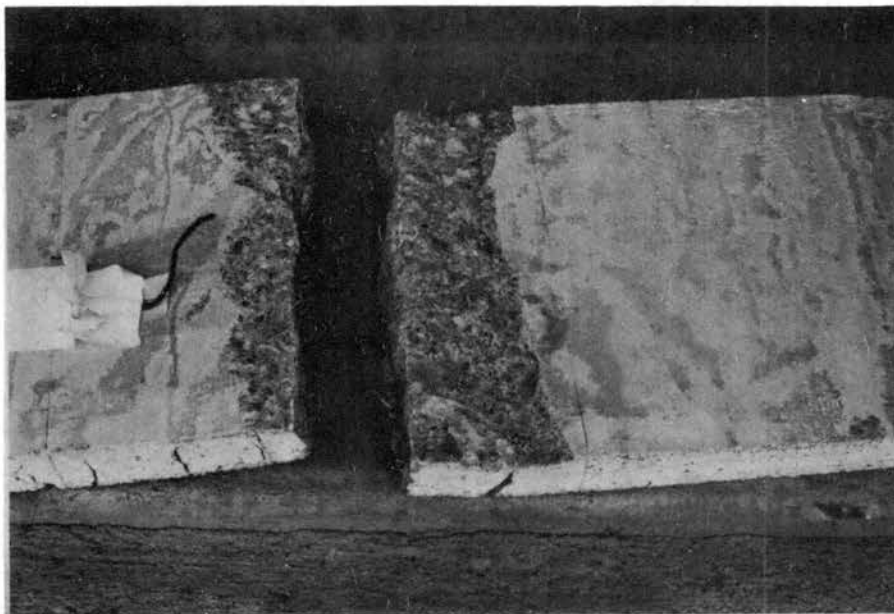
Failure Due to Spalling, or Stratification at Compressive Surface of Panel 14-2.
